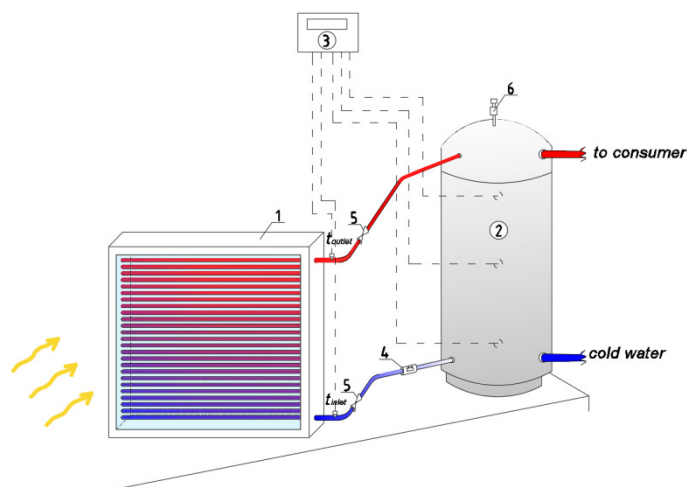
Combined solar window system, where: 1 - solar window; 2 - storage tank; 3 - temperature sensor; 4 - circulation pump; 5 - regulating valves; 6 - air release valve
